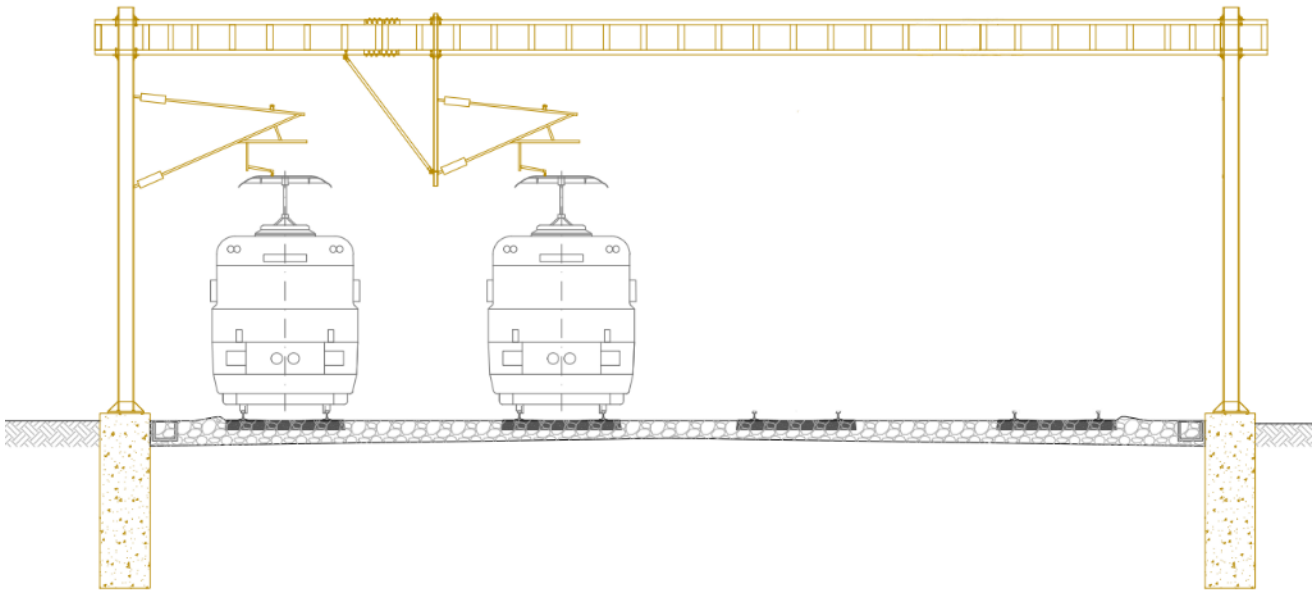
Typical OHLE portal arrangement in four track open route (Northern Tracks Electrified)
